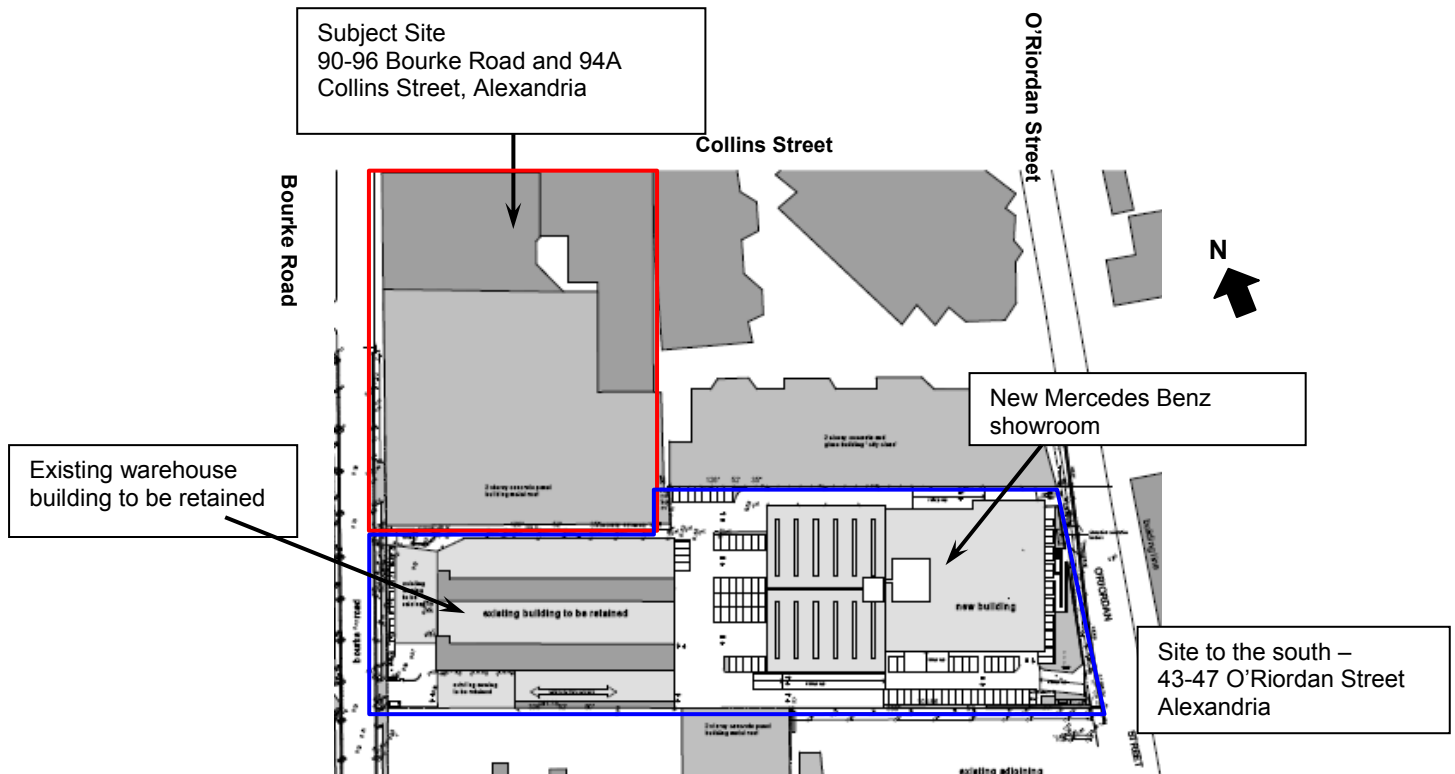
Site to the south – Existing building to be retained extends across the whole of the site boundary of the subject site to the north.
